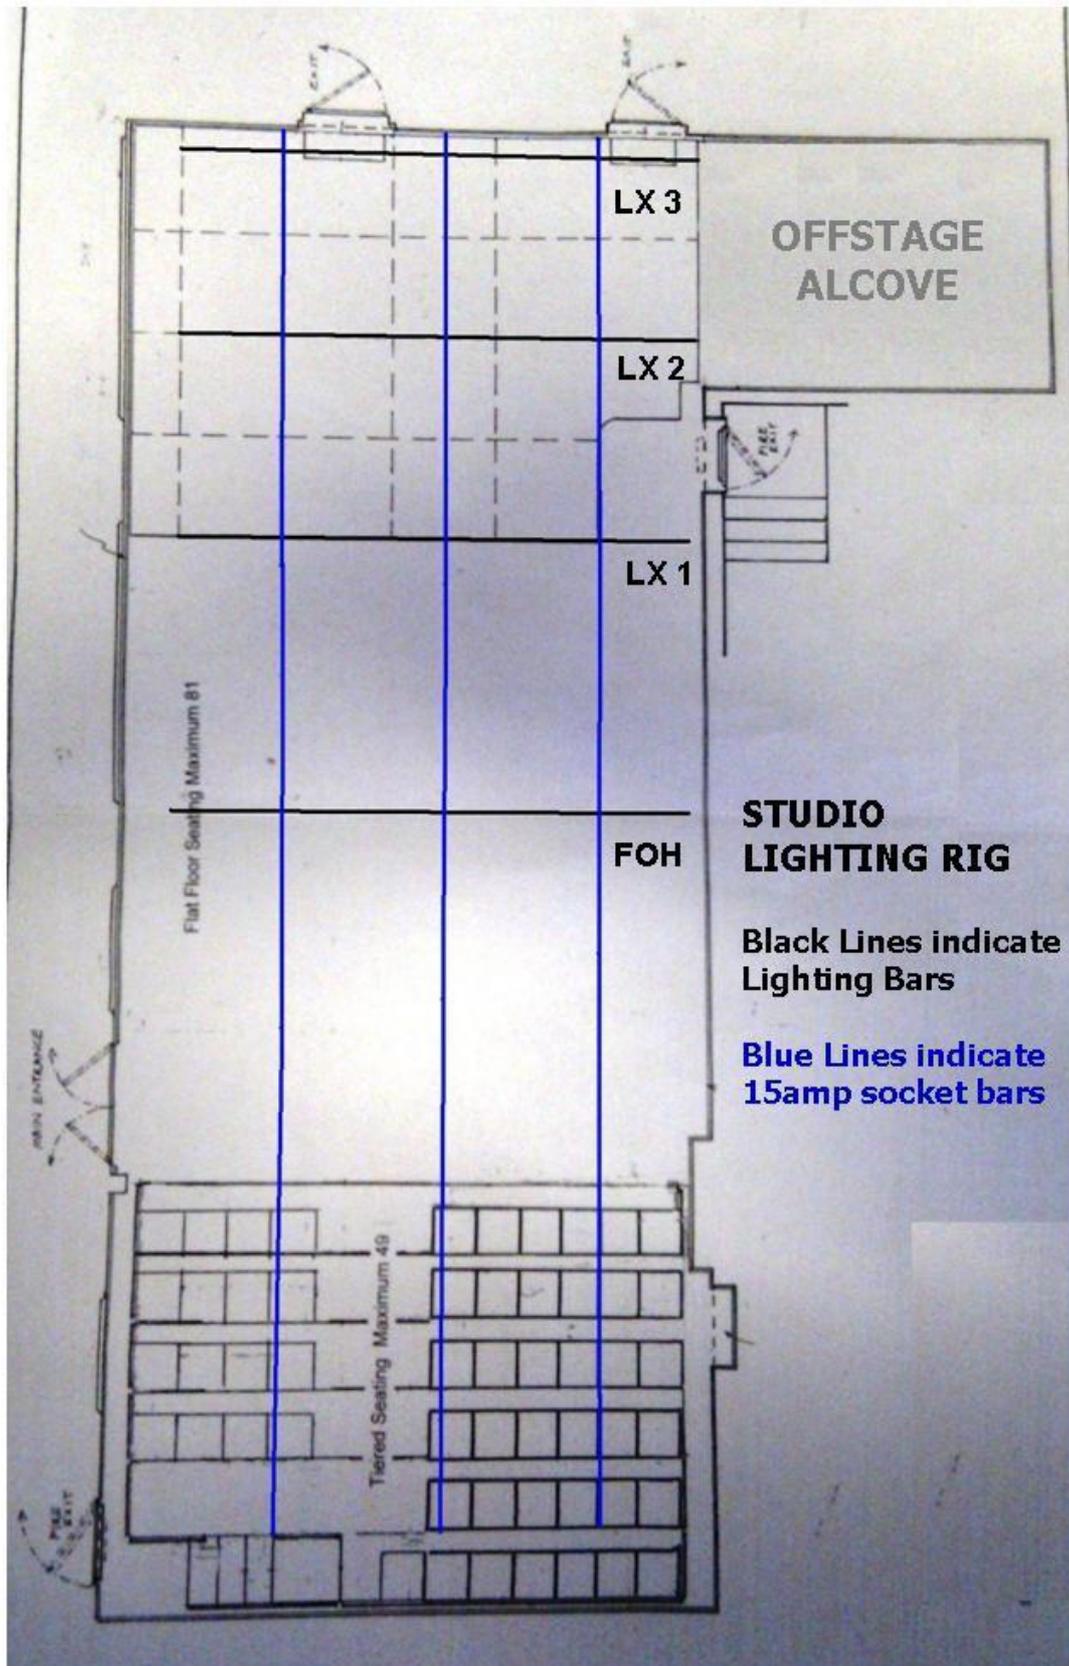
Studio Lighting Bar plan: Flat Floor Seating Not Shown
